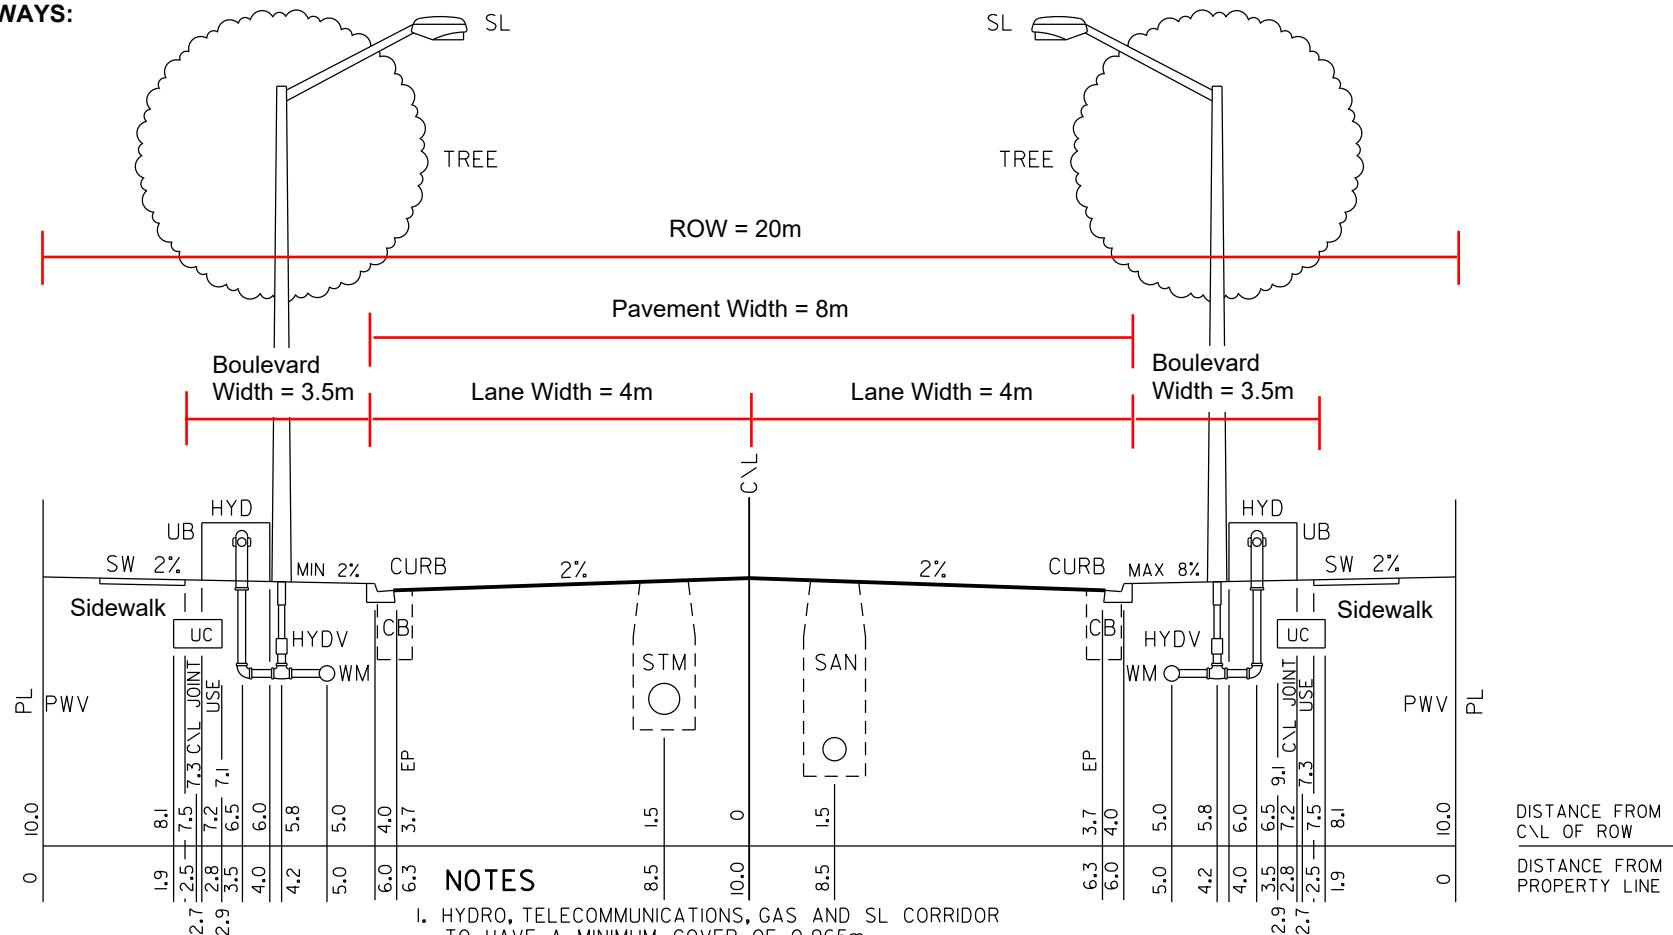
LOCAL ROADWAY CROSS-SECTION
